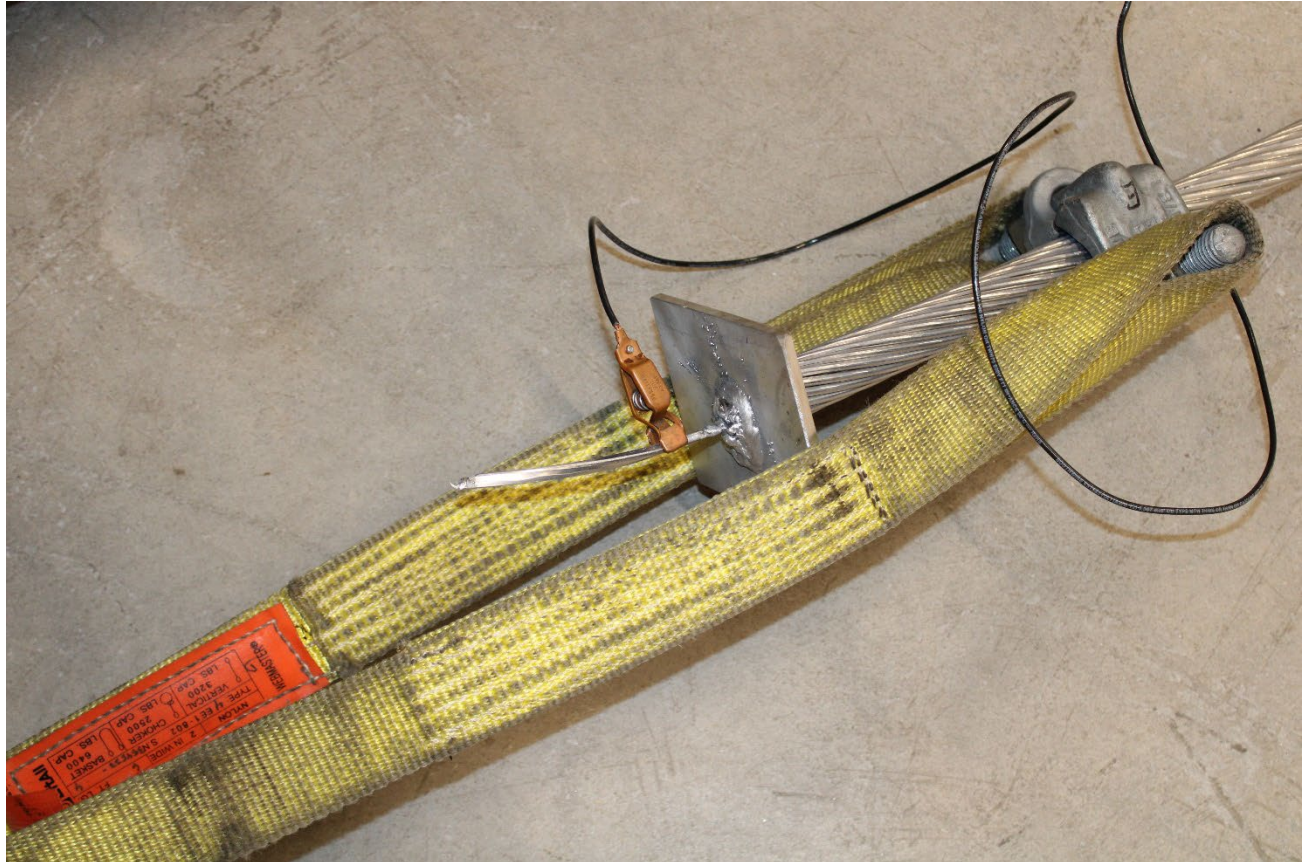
Puddle-Welded Equalizer and Bolted Clamp, Typical Each End
